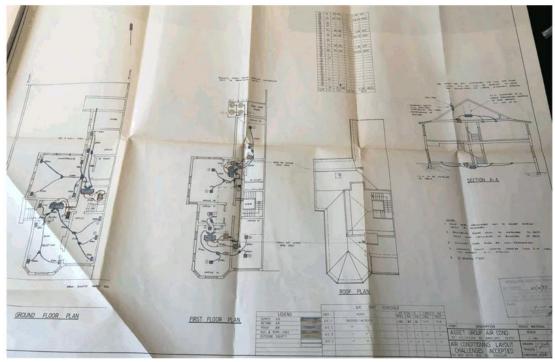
Plans dated June 1989 for 142 New South Head Road.
